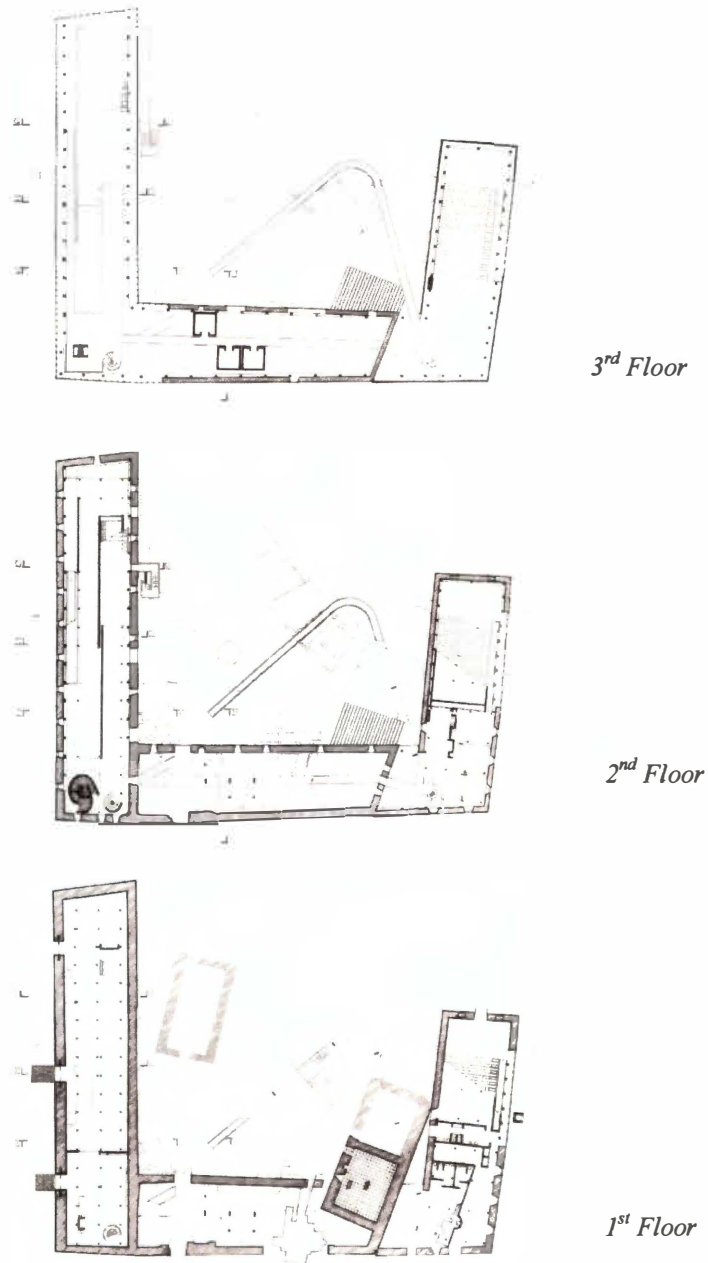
A-1 Hedmark Cathedral Museum Floor Plans
